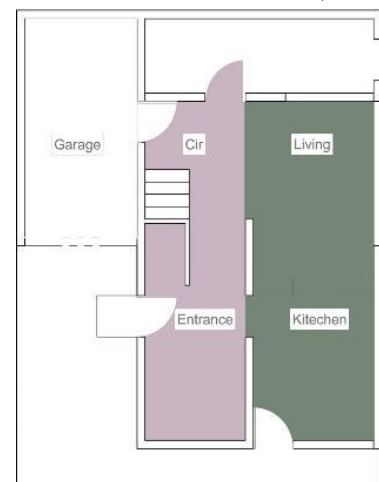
Efruz House Type 2, Open Plan (Drawing by Author).
